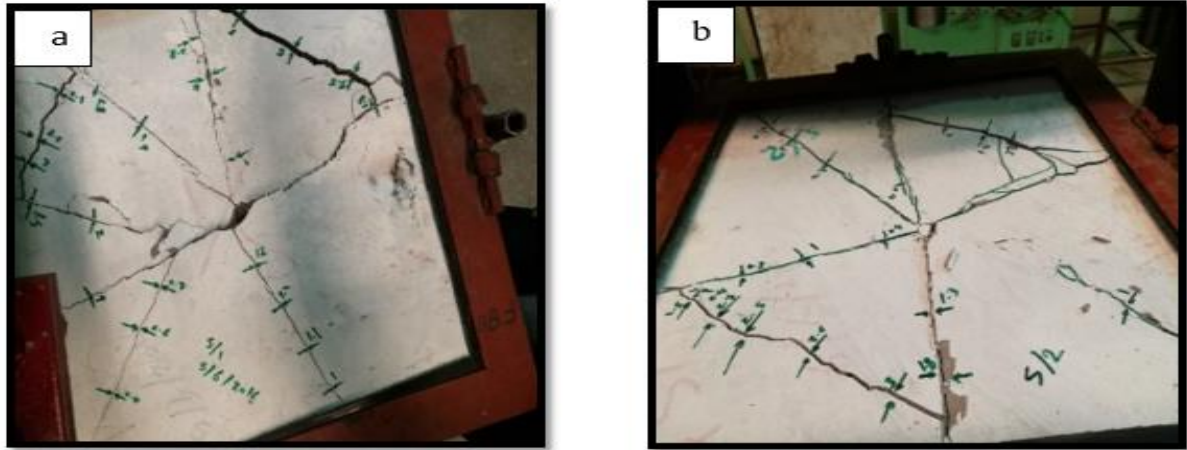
Crack pattern of ferrocement. a) One layer b) Two layers.
